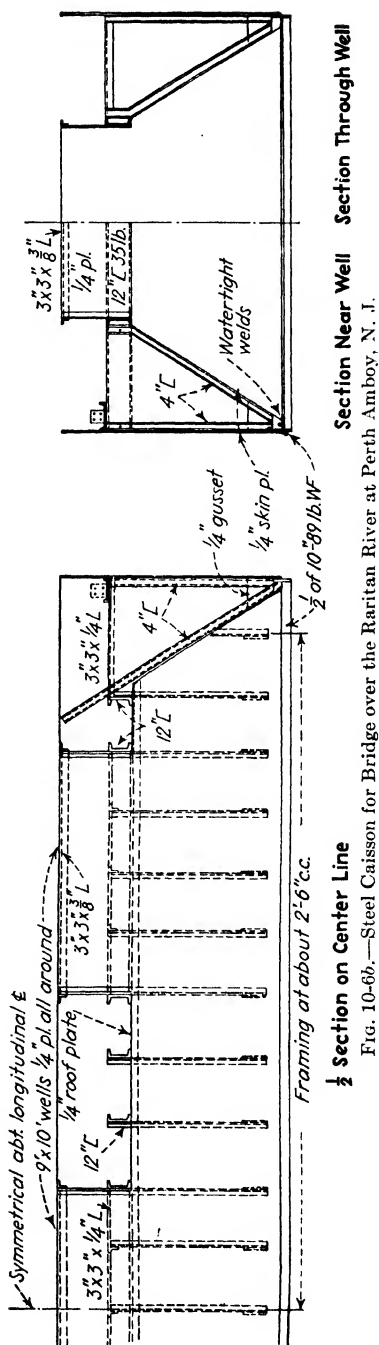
Steel Caisson for Bridge over the Raritan River at Perth Amboy, N. J.
